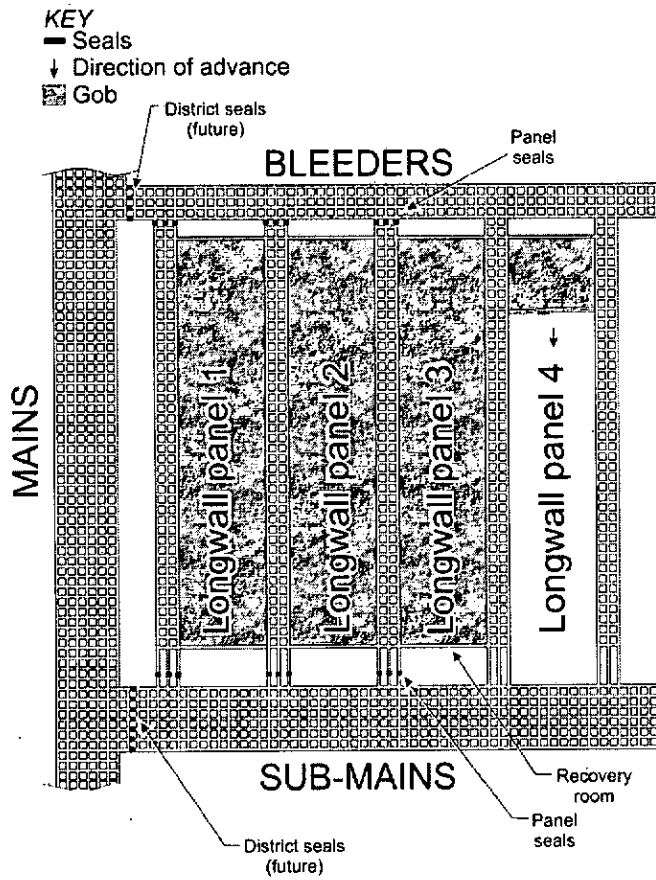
A – Typical layout of longwall mining with delayed panel sealing. Also shown are typical locations for district and panel seals.
